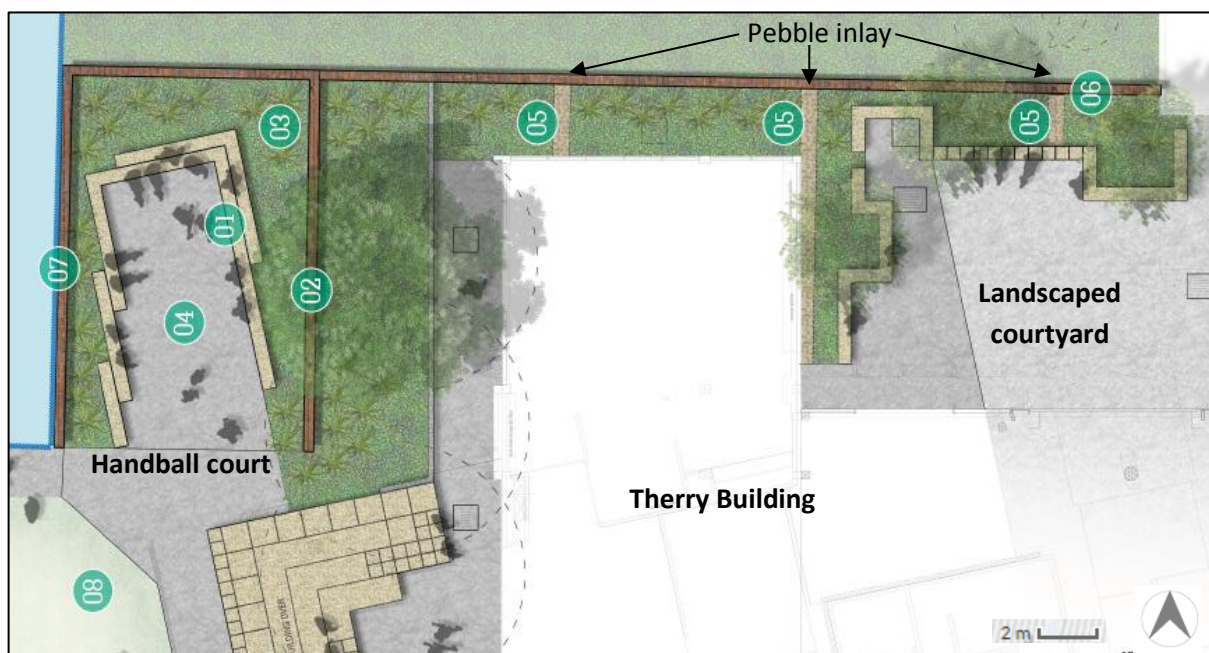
Proposed landscaping plan (Source: Applicants modification application)
